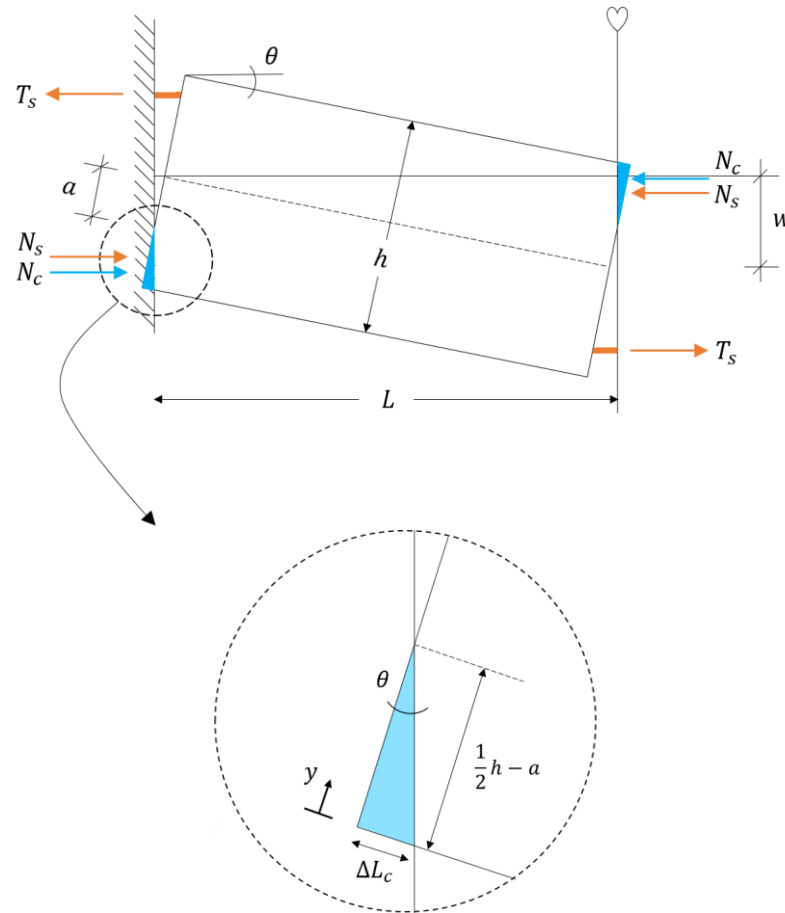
Deflected geometry of the fully restrained concrete slab strip.
